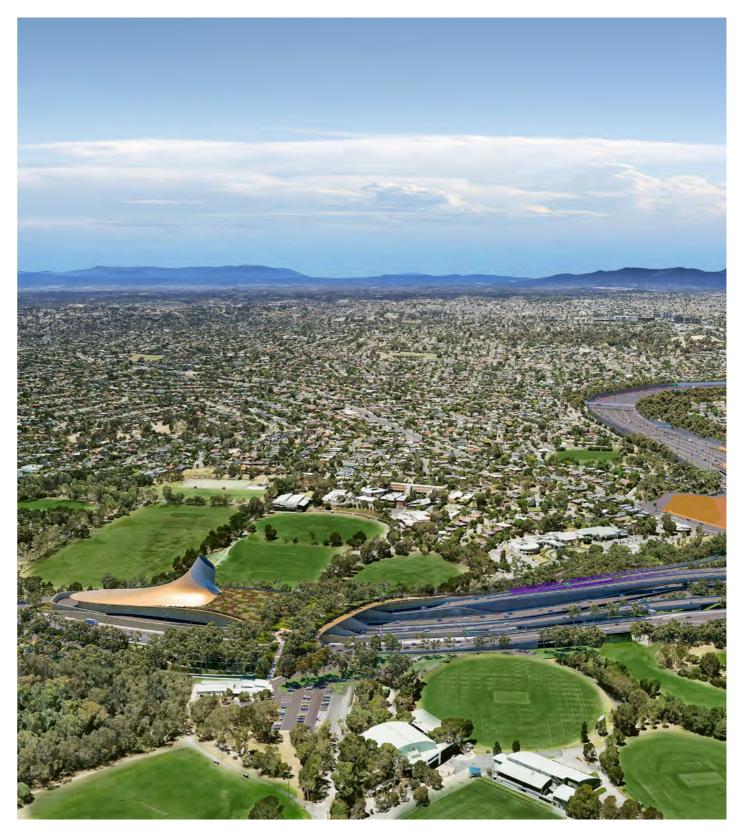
Indicative render: Bulleen Road looking south east towards the Southern Portal and the Yarra Link green bridge
